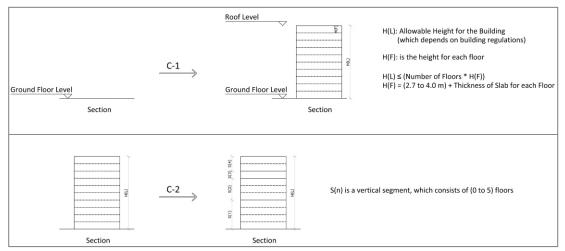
Stage (C): Rules for dividing the building into vertical segments
